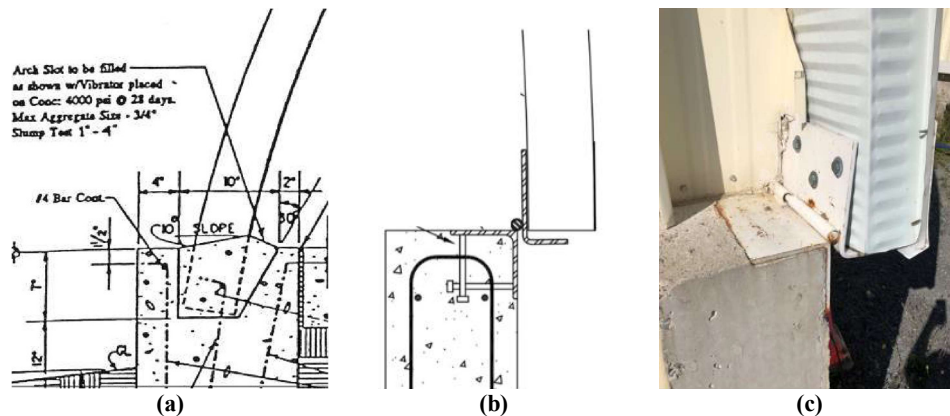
(a) M.I.C. Industries drawing, (b) sample hinge drawing and (c) hinge picture [15] [16]
